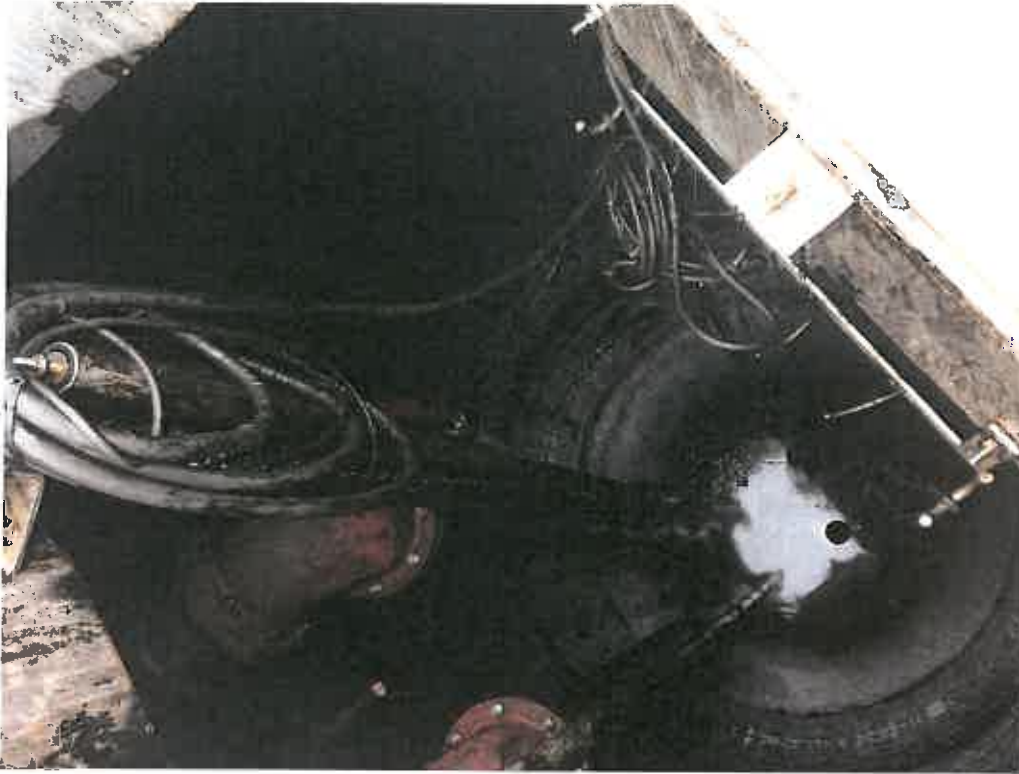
Wet well following pumping and attempt to pressure wash walls from the surface. Note heavy oil on cables and pipes.
